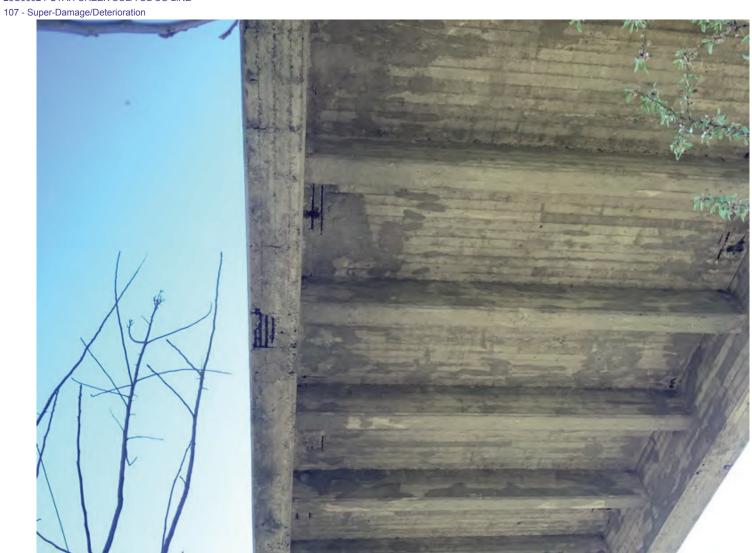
Spalls with exposed rebar in the bottom of the girders.
